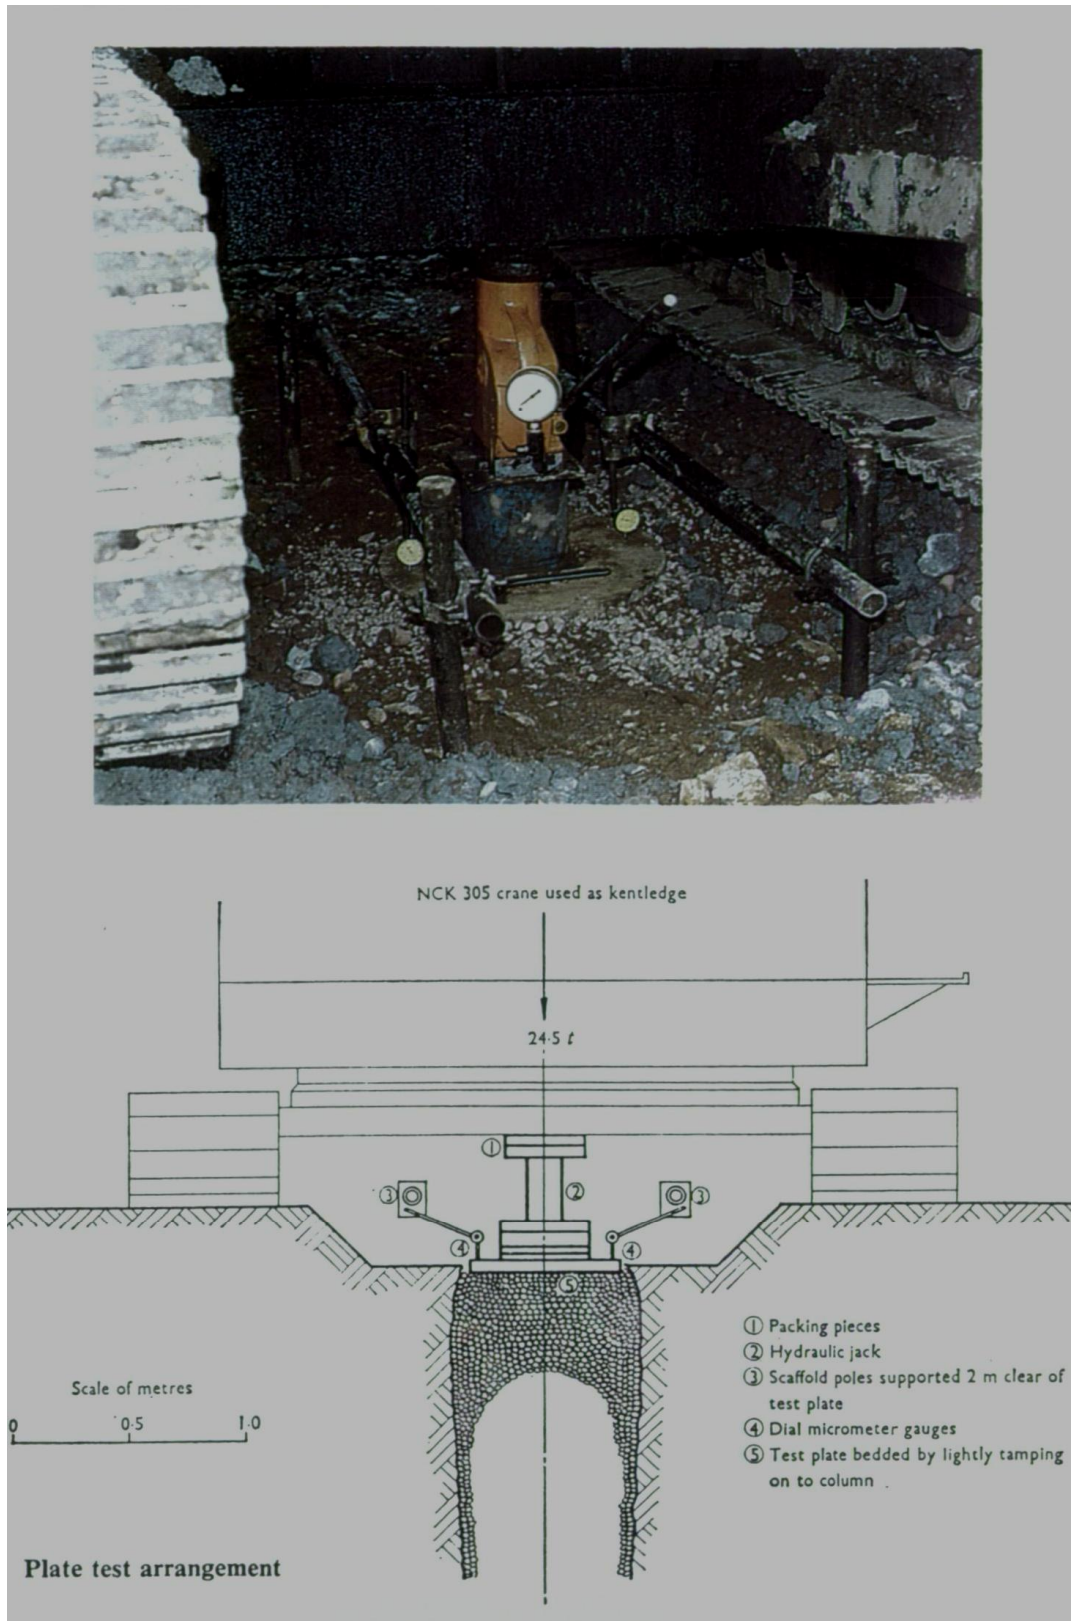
Short duration plate load tests, (after Greenwood, 1976a).
